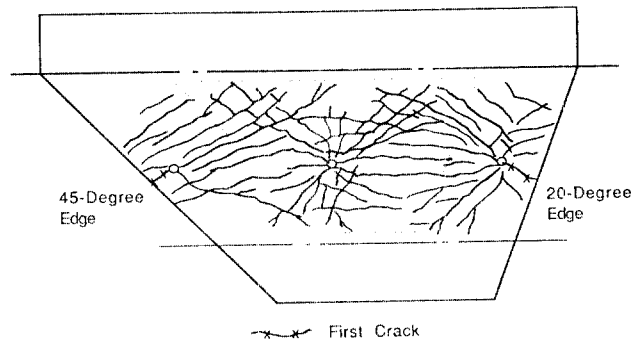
Final cracking pattern on bottom surface after tests to failure.
